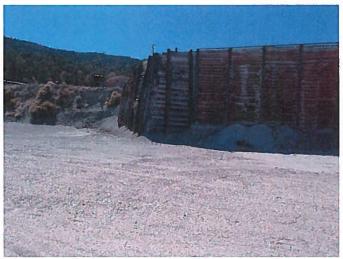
Retention wall constructed on the dump area bench, below the mine area bench.
